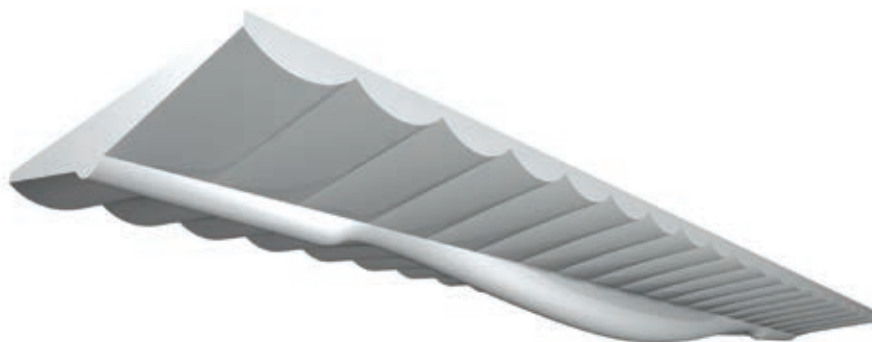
Proposed design rendering, Beam 7\_1, 7\_2 and 7\_3.
